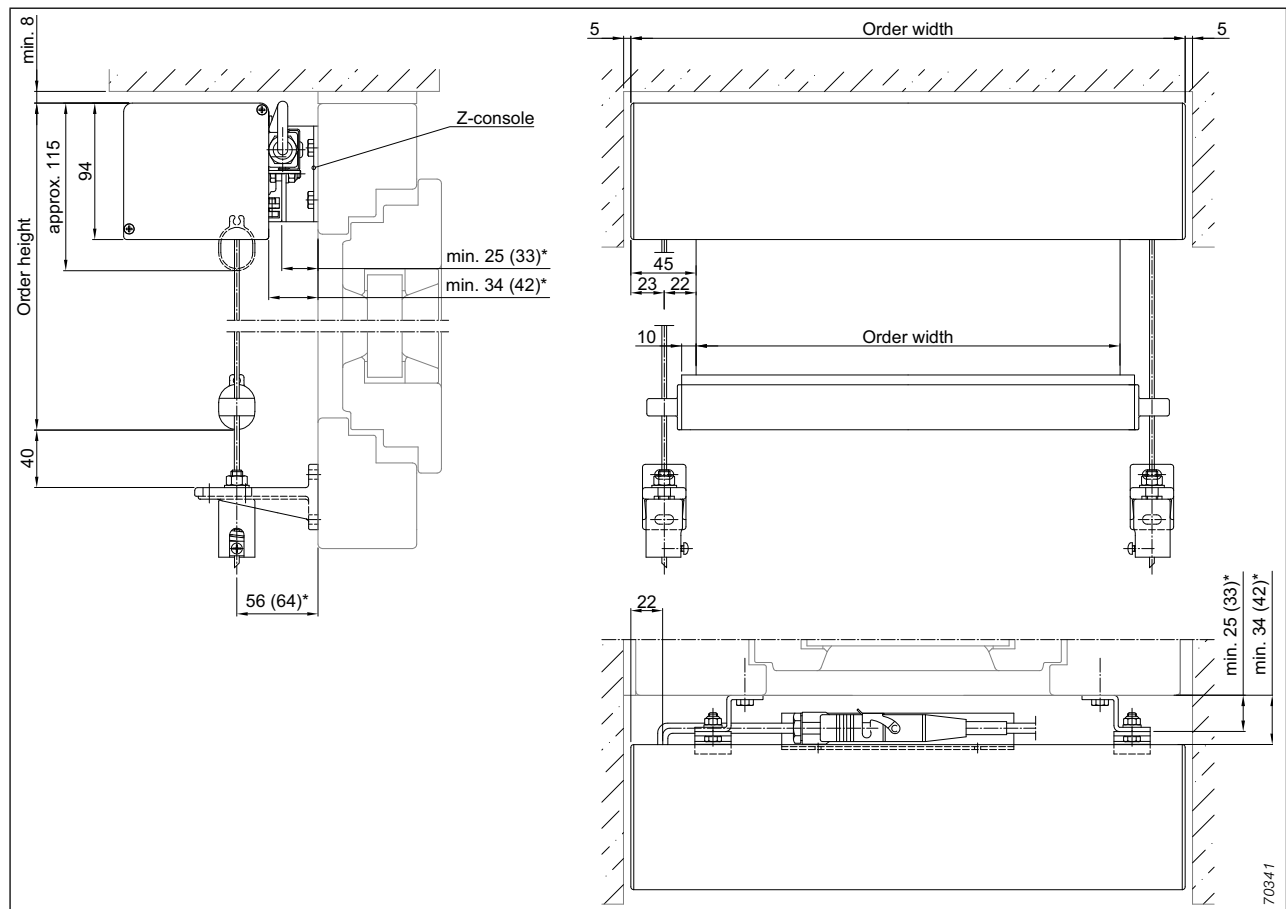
Individual unit, left rolling blind, wall installation, cable guidance with cable exit at the back
